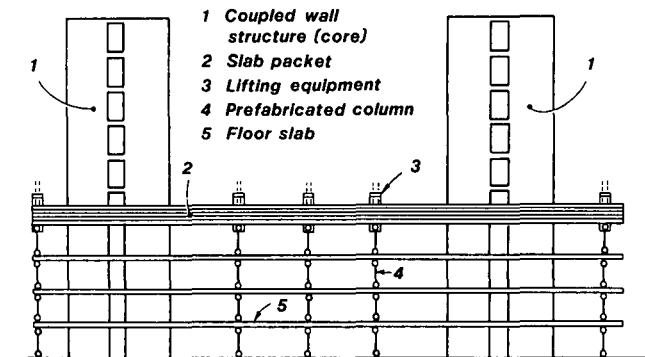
Slab-Column System Incorporating Lift Slabs and Structural Walls.
